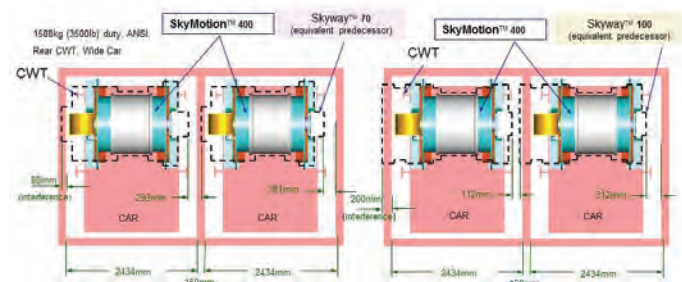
Footprint comparison for SkyMotion™ 400 machine versus Skyway™ 70 (left drawing) and Skyway™ 100 (right drawing). (Source: Otis Elevator Company)
